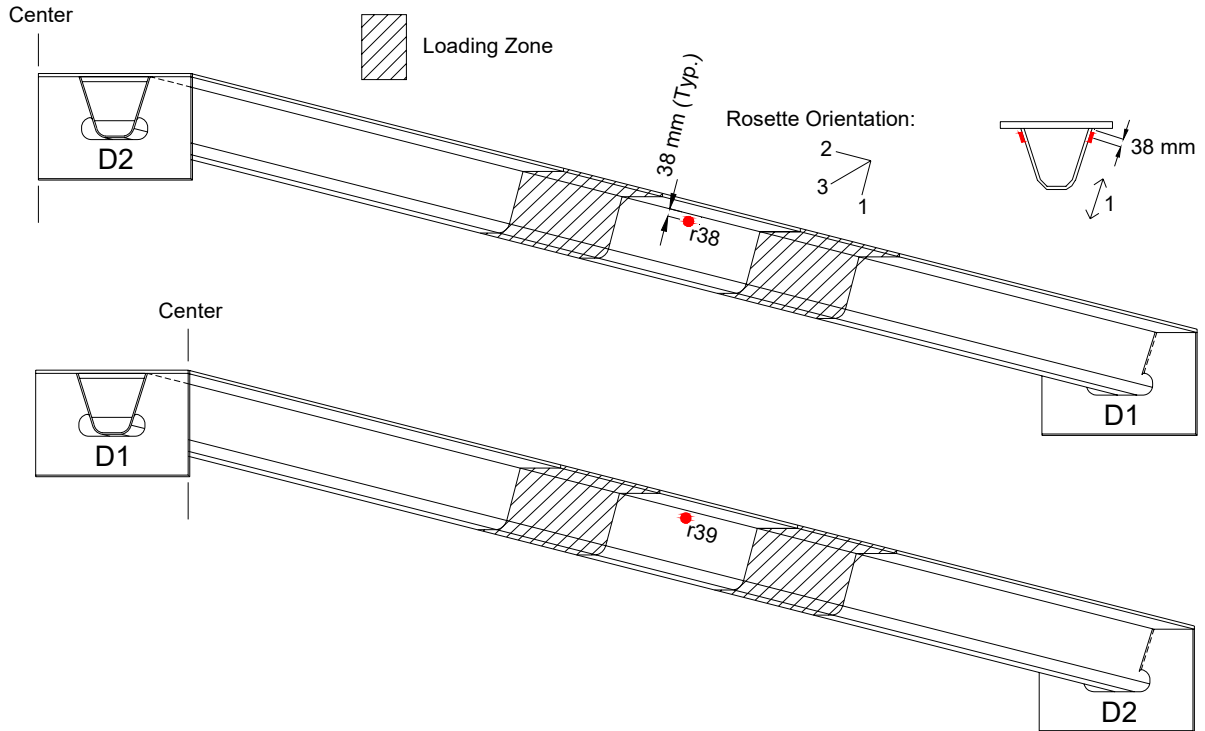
Specimen 1: Strain Gages in Outer Surface of Rib R2 near Rib-to-Deck Welds
